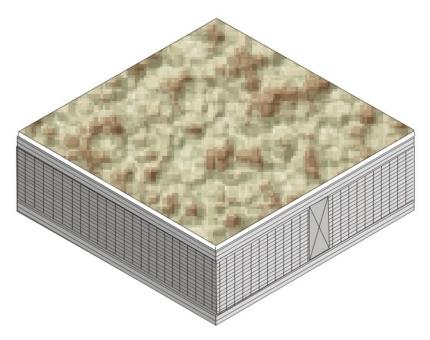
Wood Foam Panel (SIP) Floor
